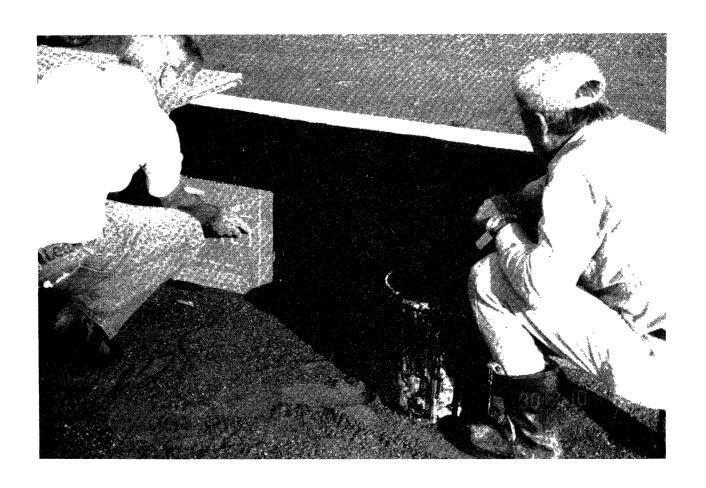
Bentonite panels are being placed against sealed platform sidewalls, to minimize wall effects.
